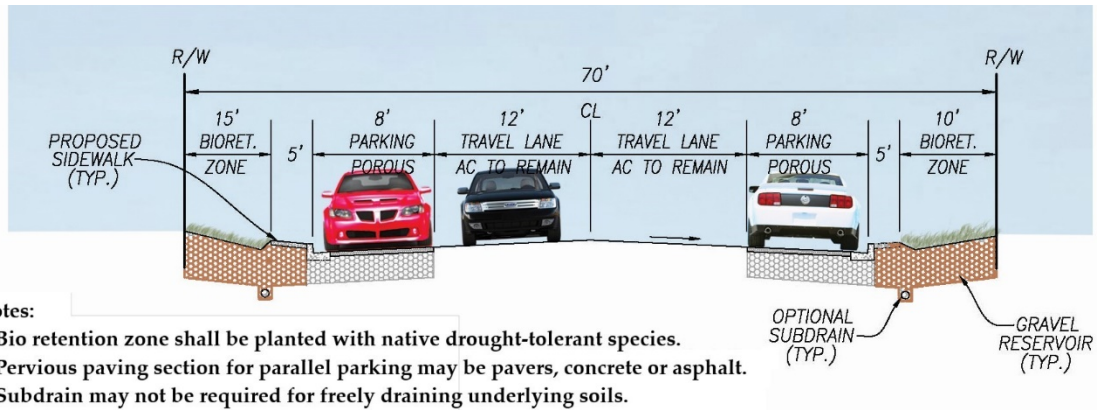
Main Street Cross-Section –Heald Avenue to Sulphur Street
